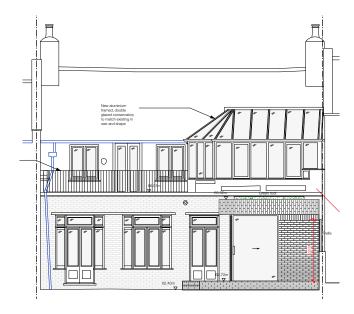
Proposed rear elevation of no. 75 Belsize Lane.
